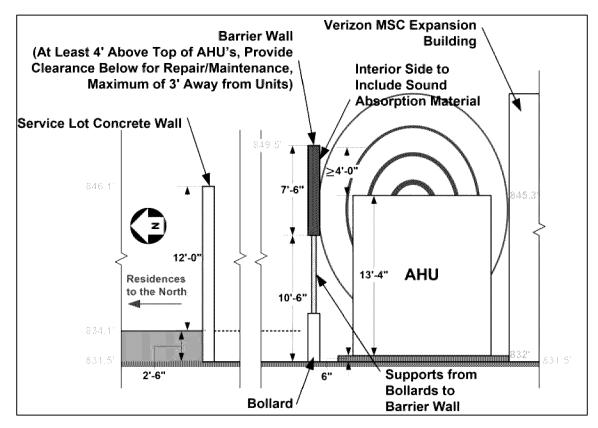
Elevation sketch of the proposed AHU noise control barrier wall.
